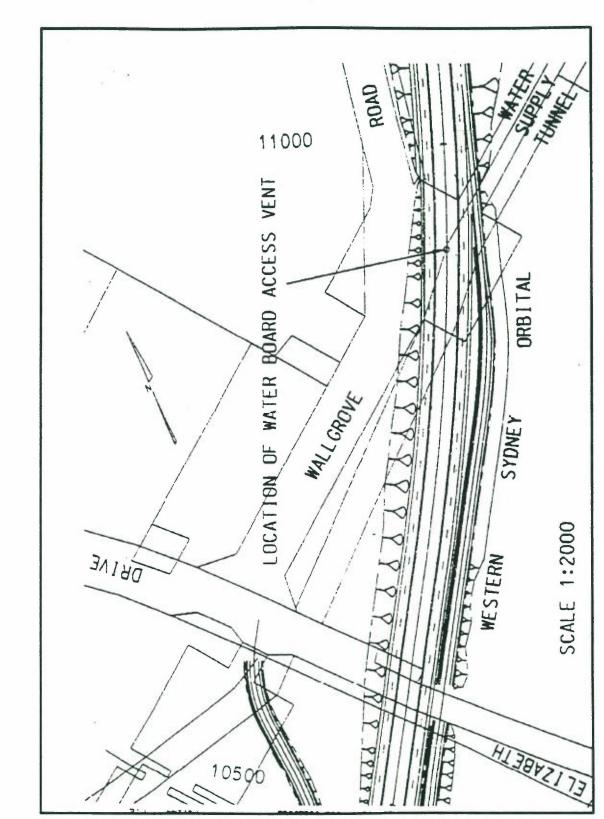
Plan showing the proposed line of the WSO and the position of the vent.
